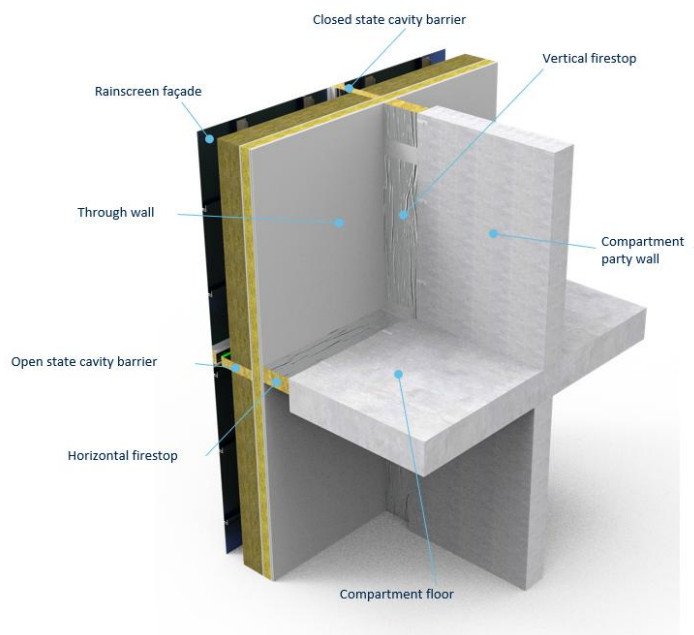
Internal compartment wall and floor interfacing with building envelope showing examples of both cavity barriers and fire barriers (firestops).
